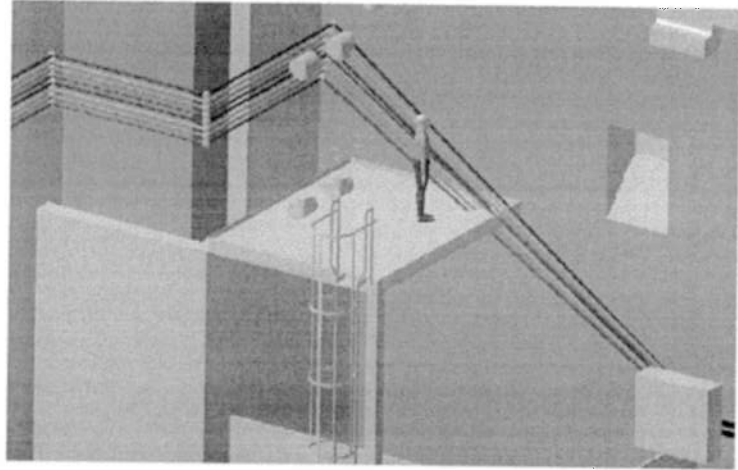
The Pumpout tees will be positioned in JIT just before the the JIT-JID barrier. Acces to the pumping units is obtained from the existing platform found in the south-east corner of JIT.
